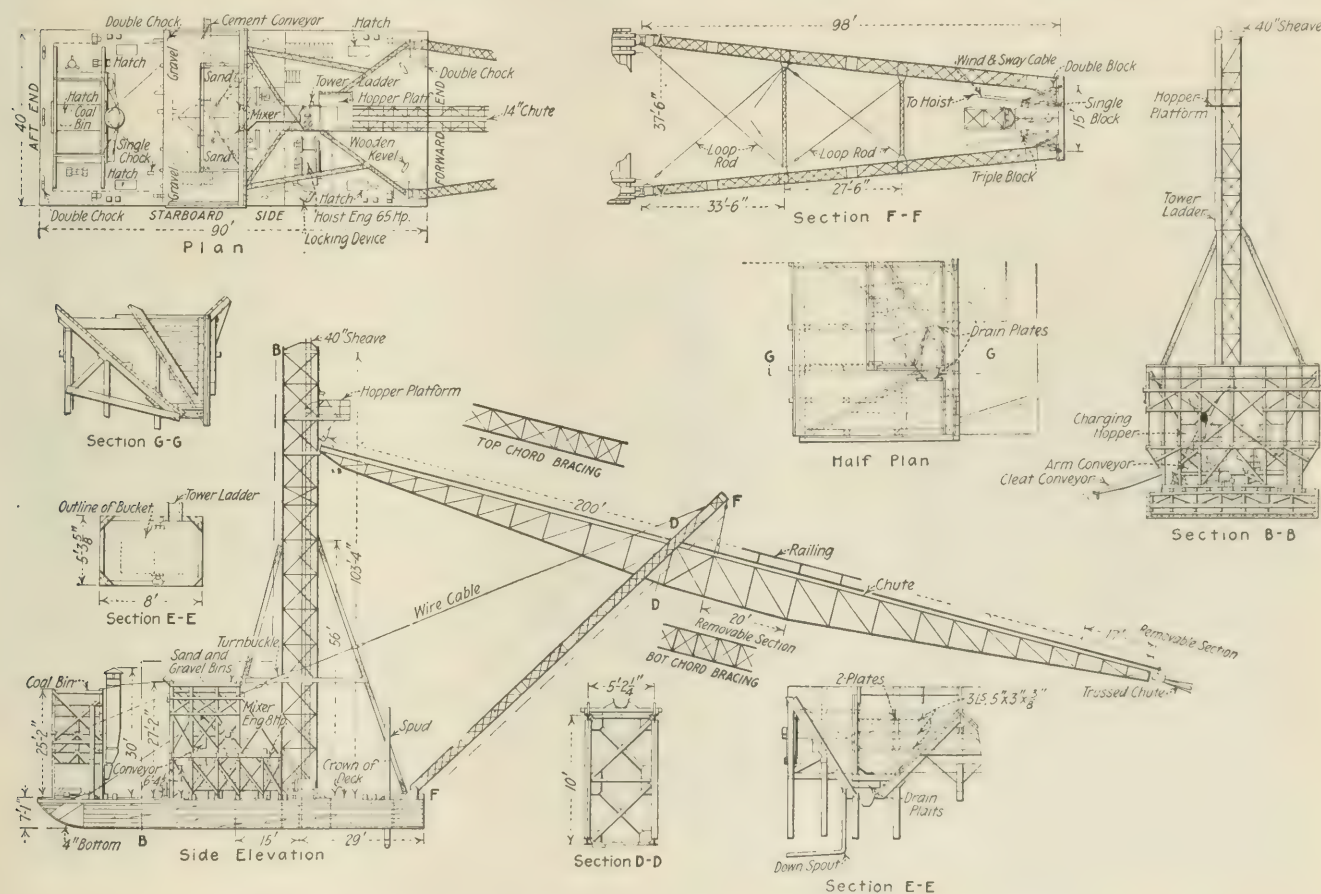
DETAILS OF THE OHIO RIVER FLOATING CONCRETE PLANT
